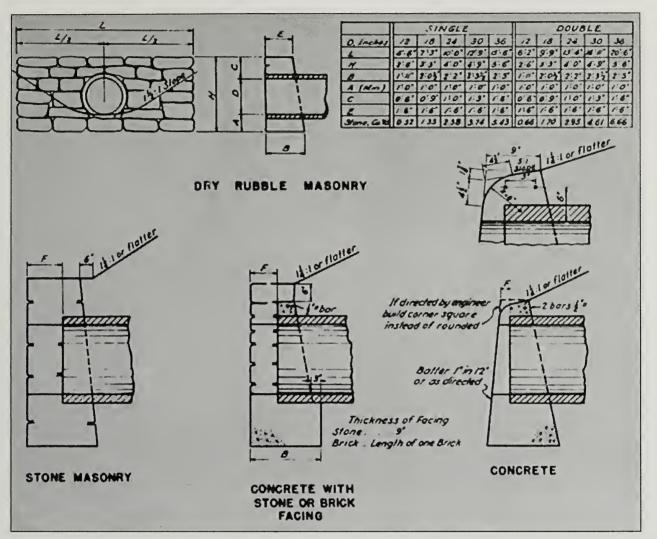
This drawing shows headwalls constructed with stone, brick, or concrete. From the West Street Extension project; repavement of Cadillac Mountain Road, Jordan Pond/Eagle Lake Road, and Stanley Brook Road; and the Schooner Head Overlook Access Road project. (U.S. Department of Commerce, Bureau of Public Roads, Project 6A5, Sheet 8 of 24, July 1952; Project 1A7-4A3-7A2-33A1, Sheet 9 of 69, November 1955; and Project 22A1, Sheet 7 of 12, May 1957)
